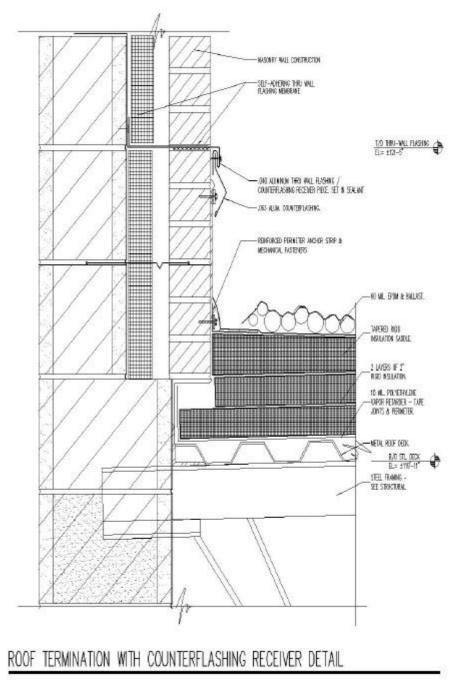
Incorporating a counterflashing receiver in the through-wall system, noting its height, assists in providing the appropriate fit for roof terminations and provides for future reroofing.
